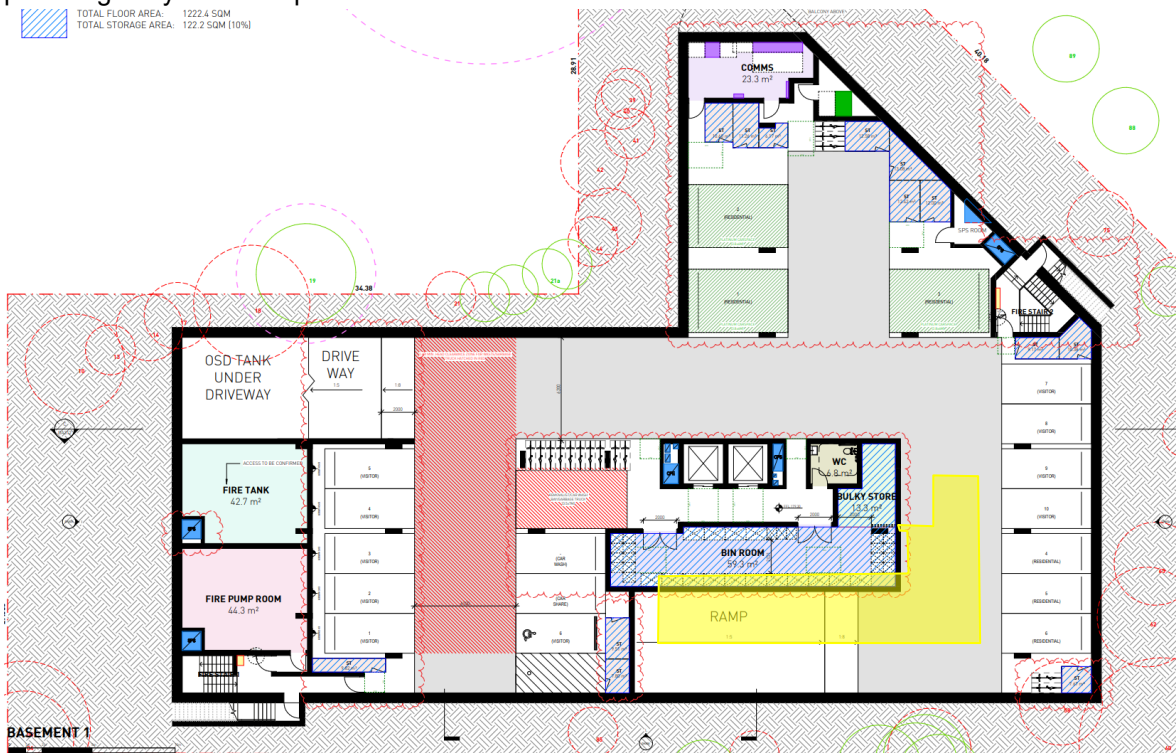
Bin room location highlighted yellow (Source: Giles Tribe)
